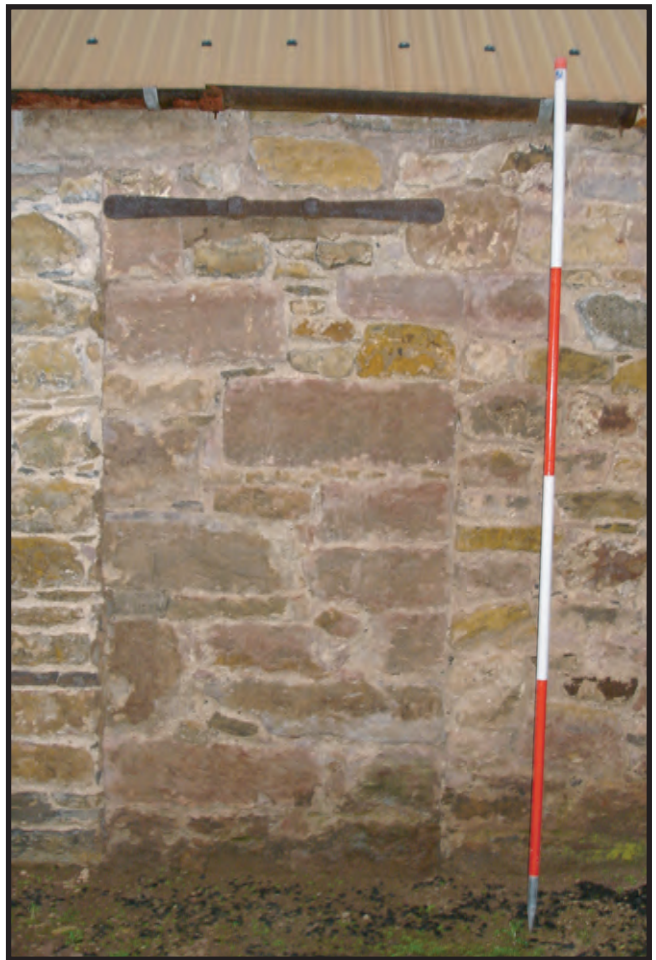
Detail of doorway F23 on the south-east facing elevation of Building A
